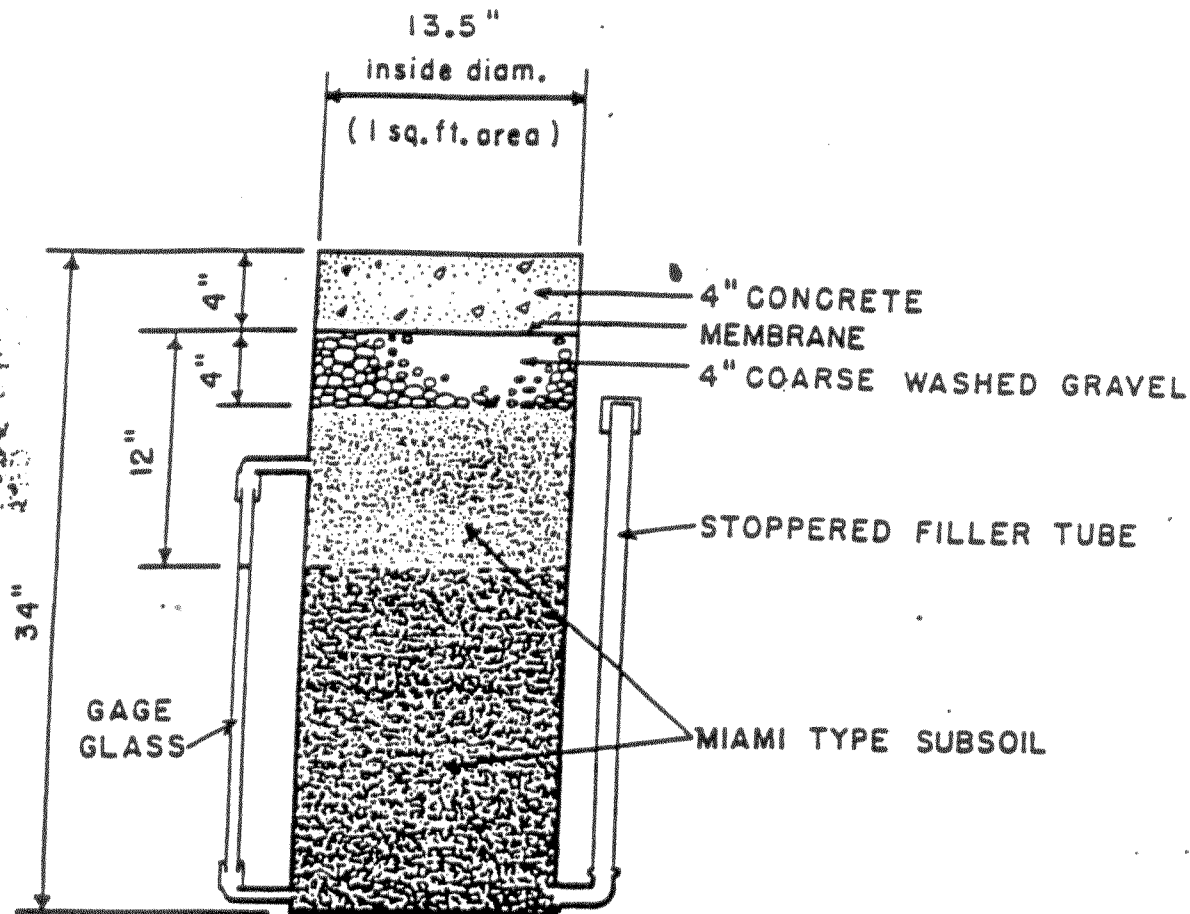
Diagrammatic sketch of cylindrical test specimens.
